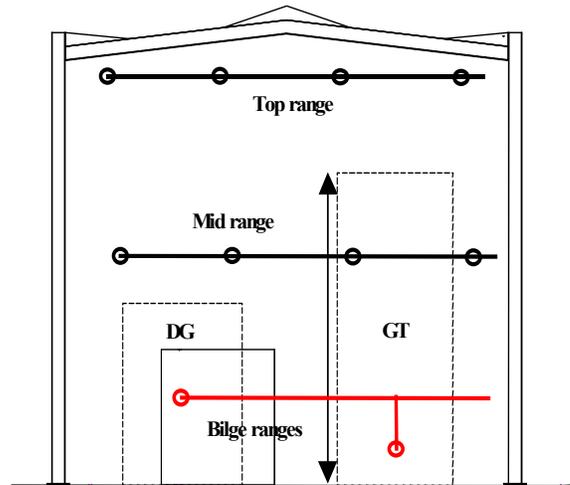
Side view of FWS pipe array in WSA’s large scale test enclosure
